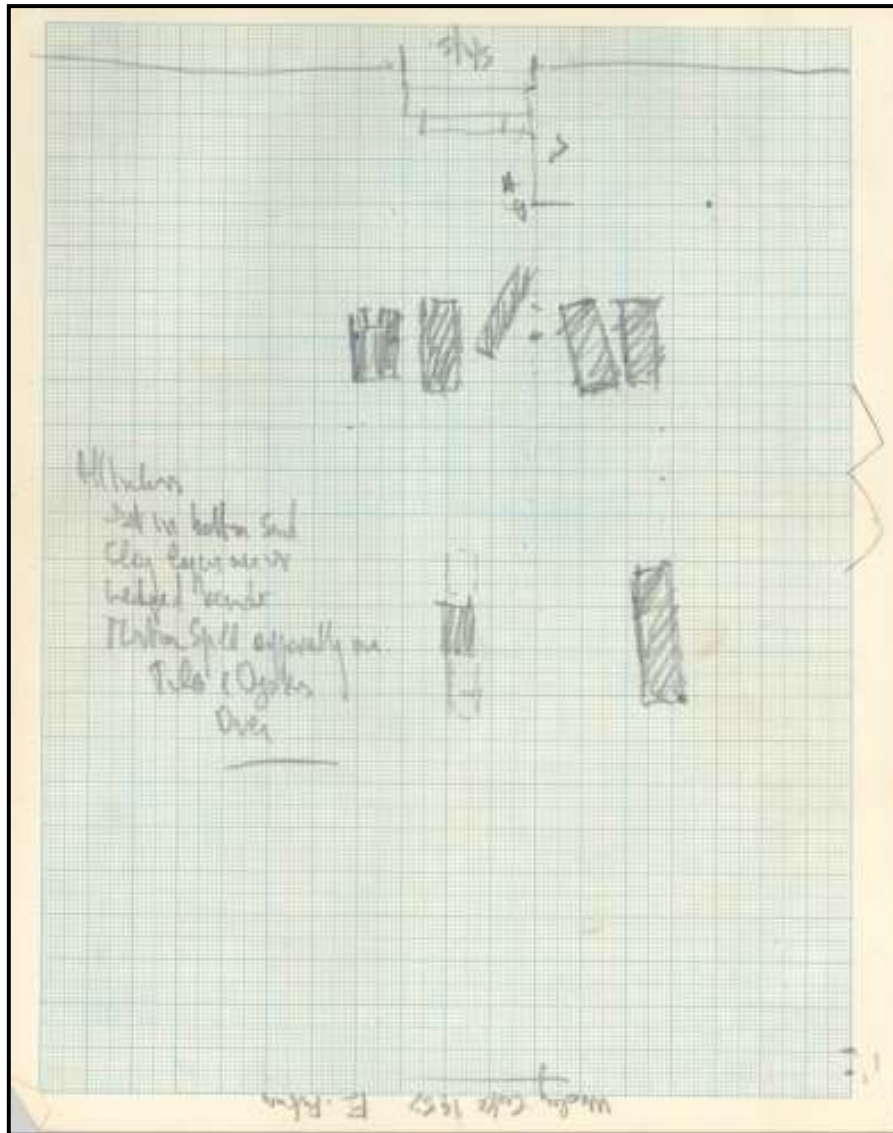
Sketch plan from notebook of the East Bridge (Scan 649)
